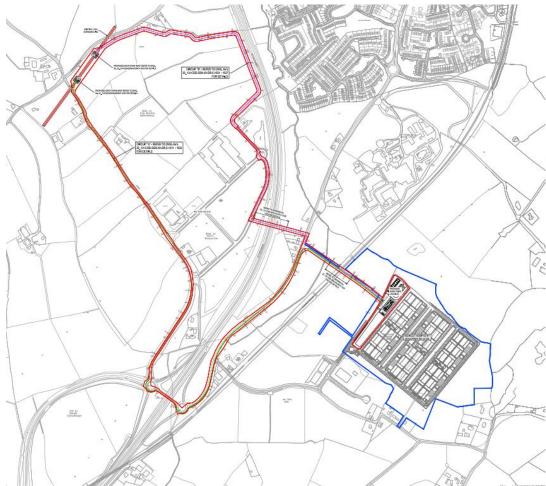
Extract from Clifton Scannell Emerson Associates Overall Route Layout Plan
